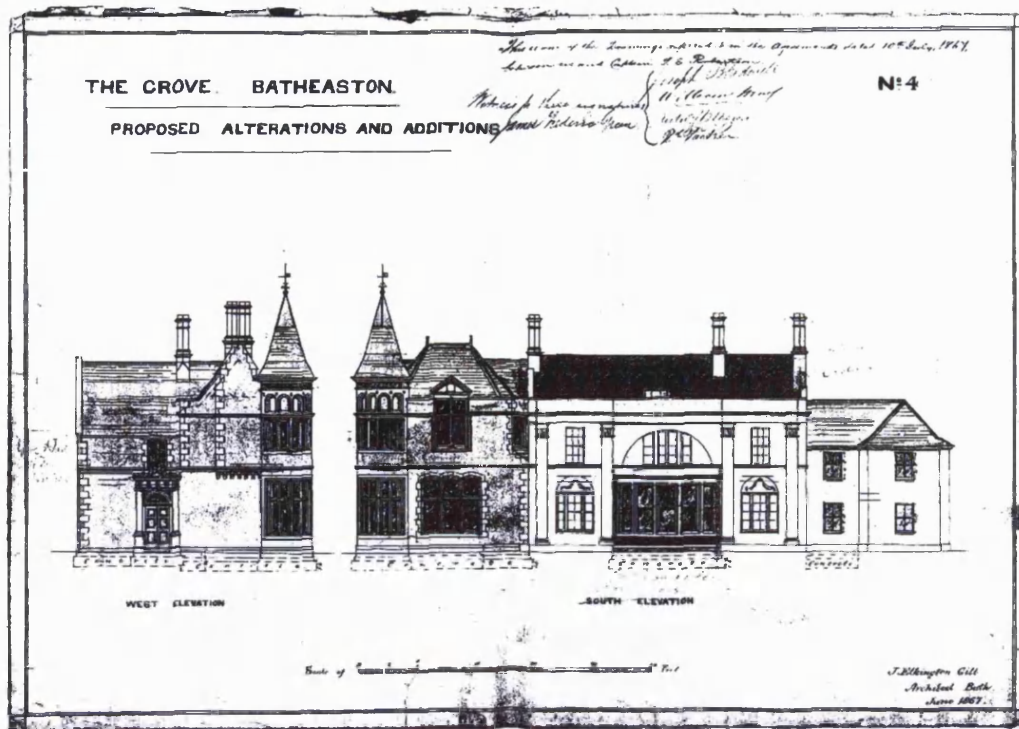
The Grove, Batheaston, Signed, J. Elkington Gill, June 1867. Contract drawing of the south front. The bow window and the right hand extension were extended later by Gill. Additional works, 1876 - 1902 by Gill & Browne and Gill & Morris.
